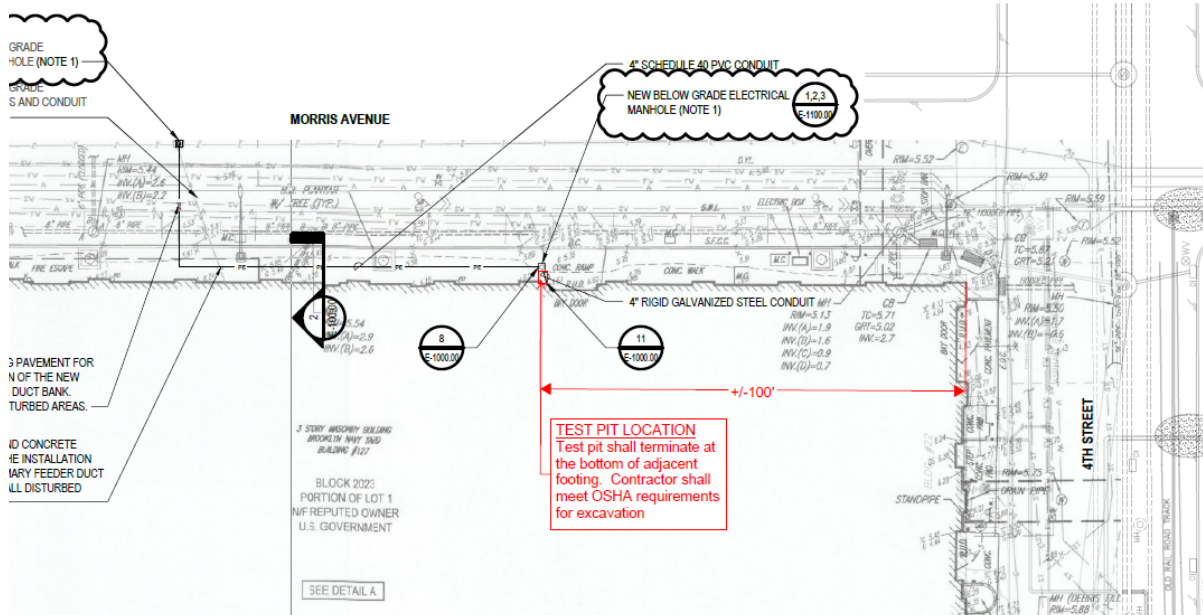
Section of Drawing E100.00 showing detail location of test pit.
